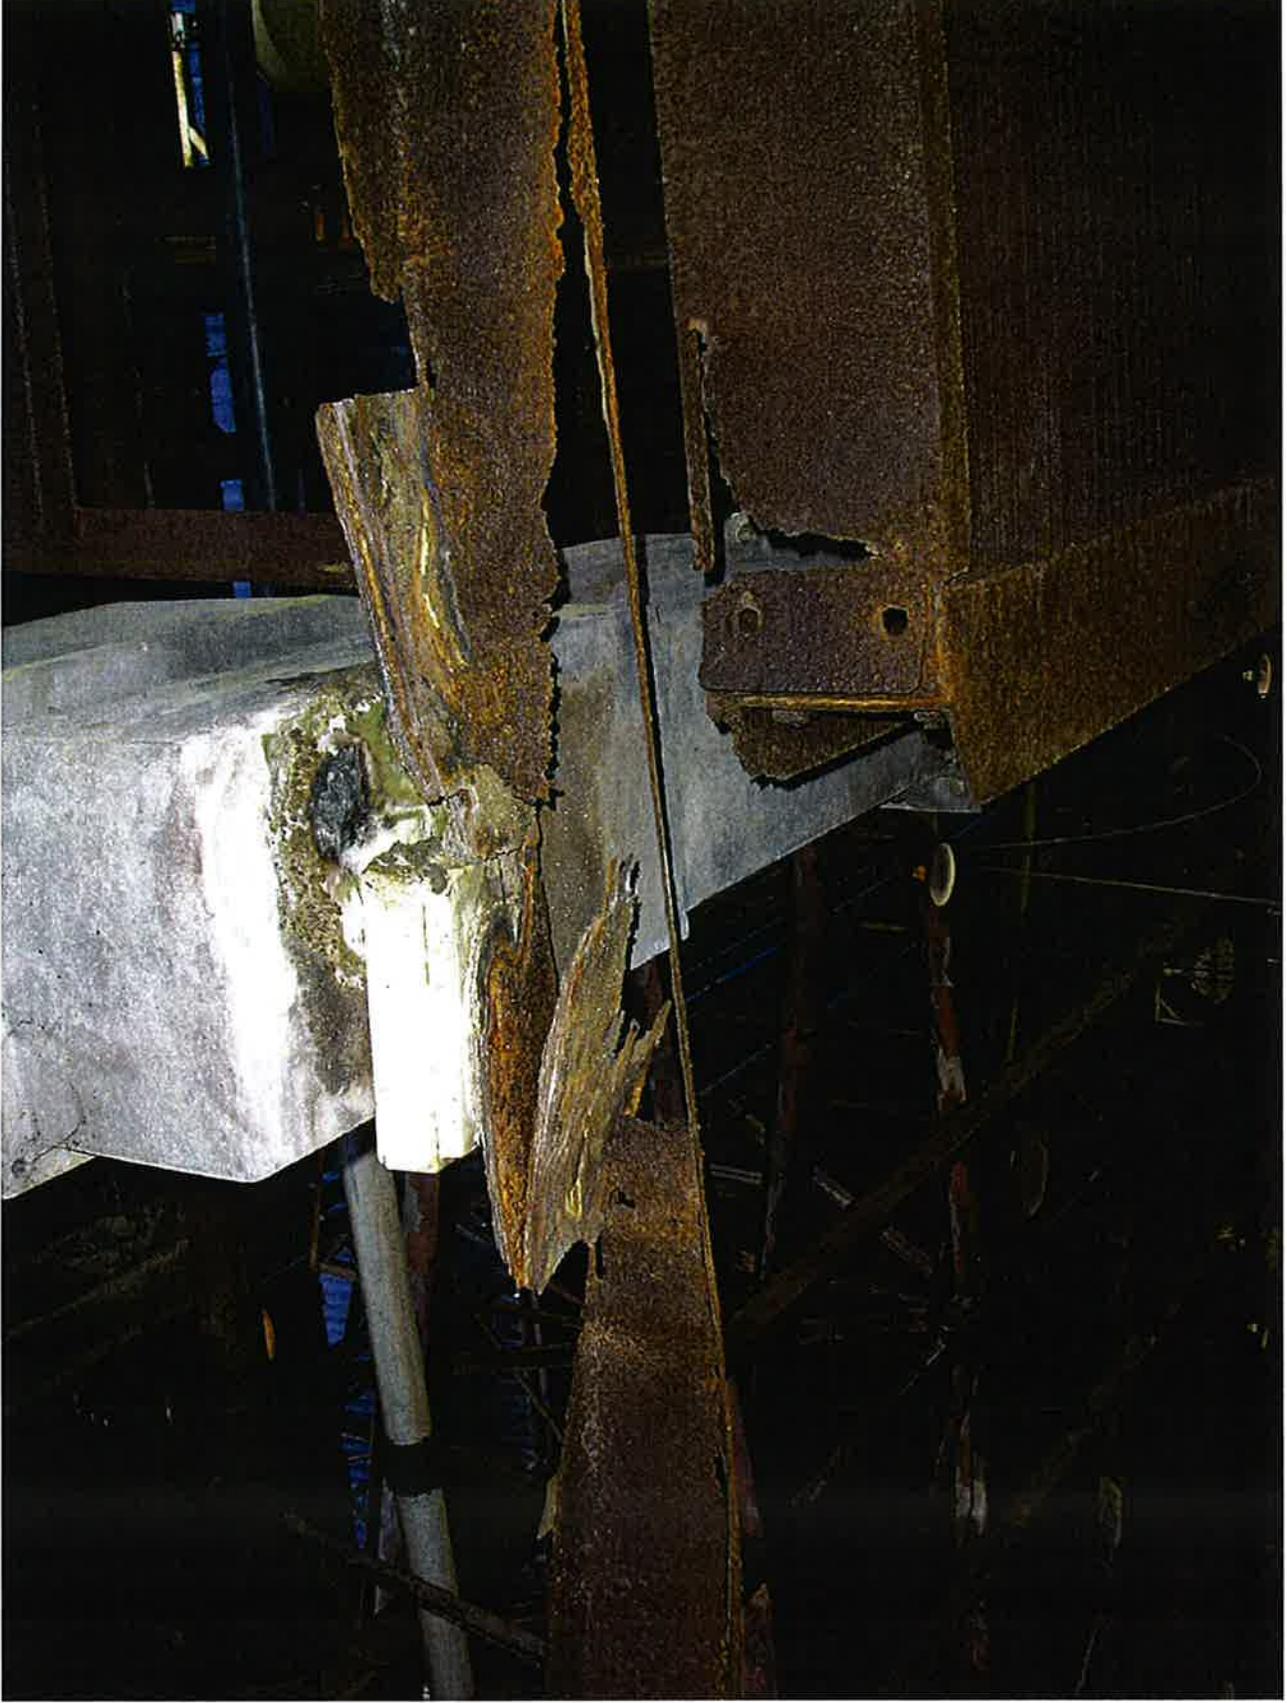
DETERIORATED FRAMING AT INTERIOR CATWALK AT WEST SIDE OF BUILDING 16
